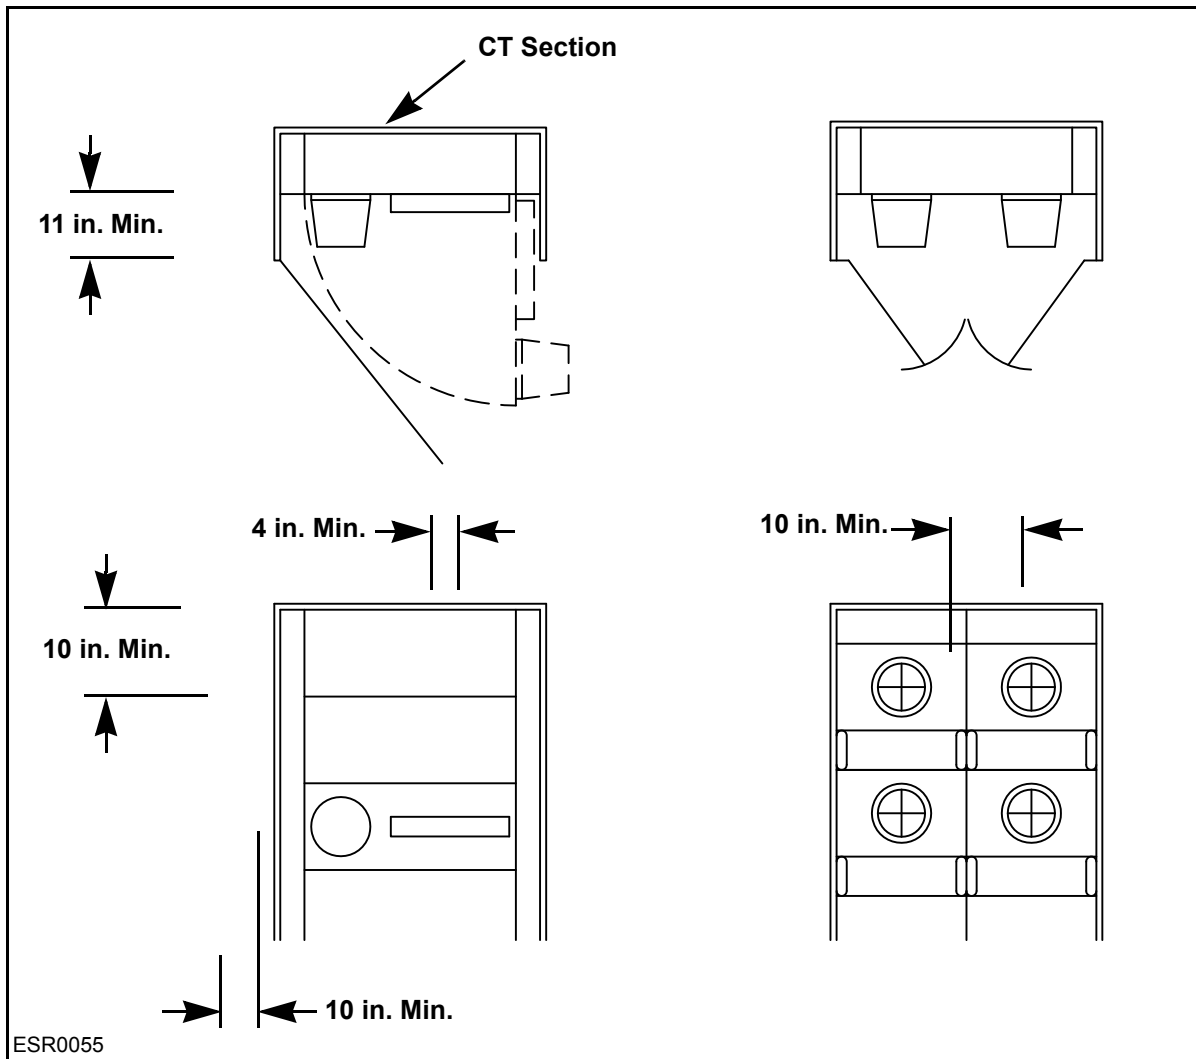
Outdoor Switchgear Metering (EUSERC 354)
